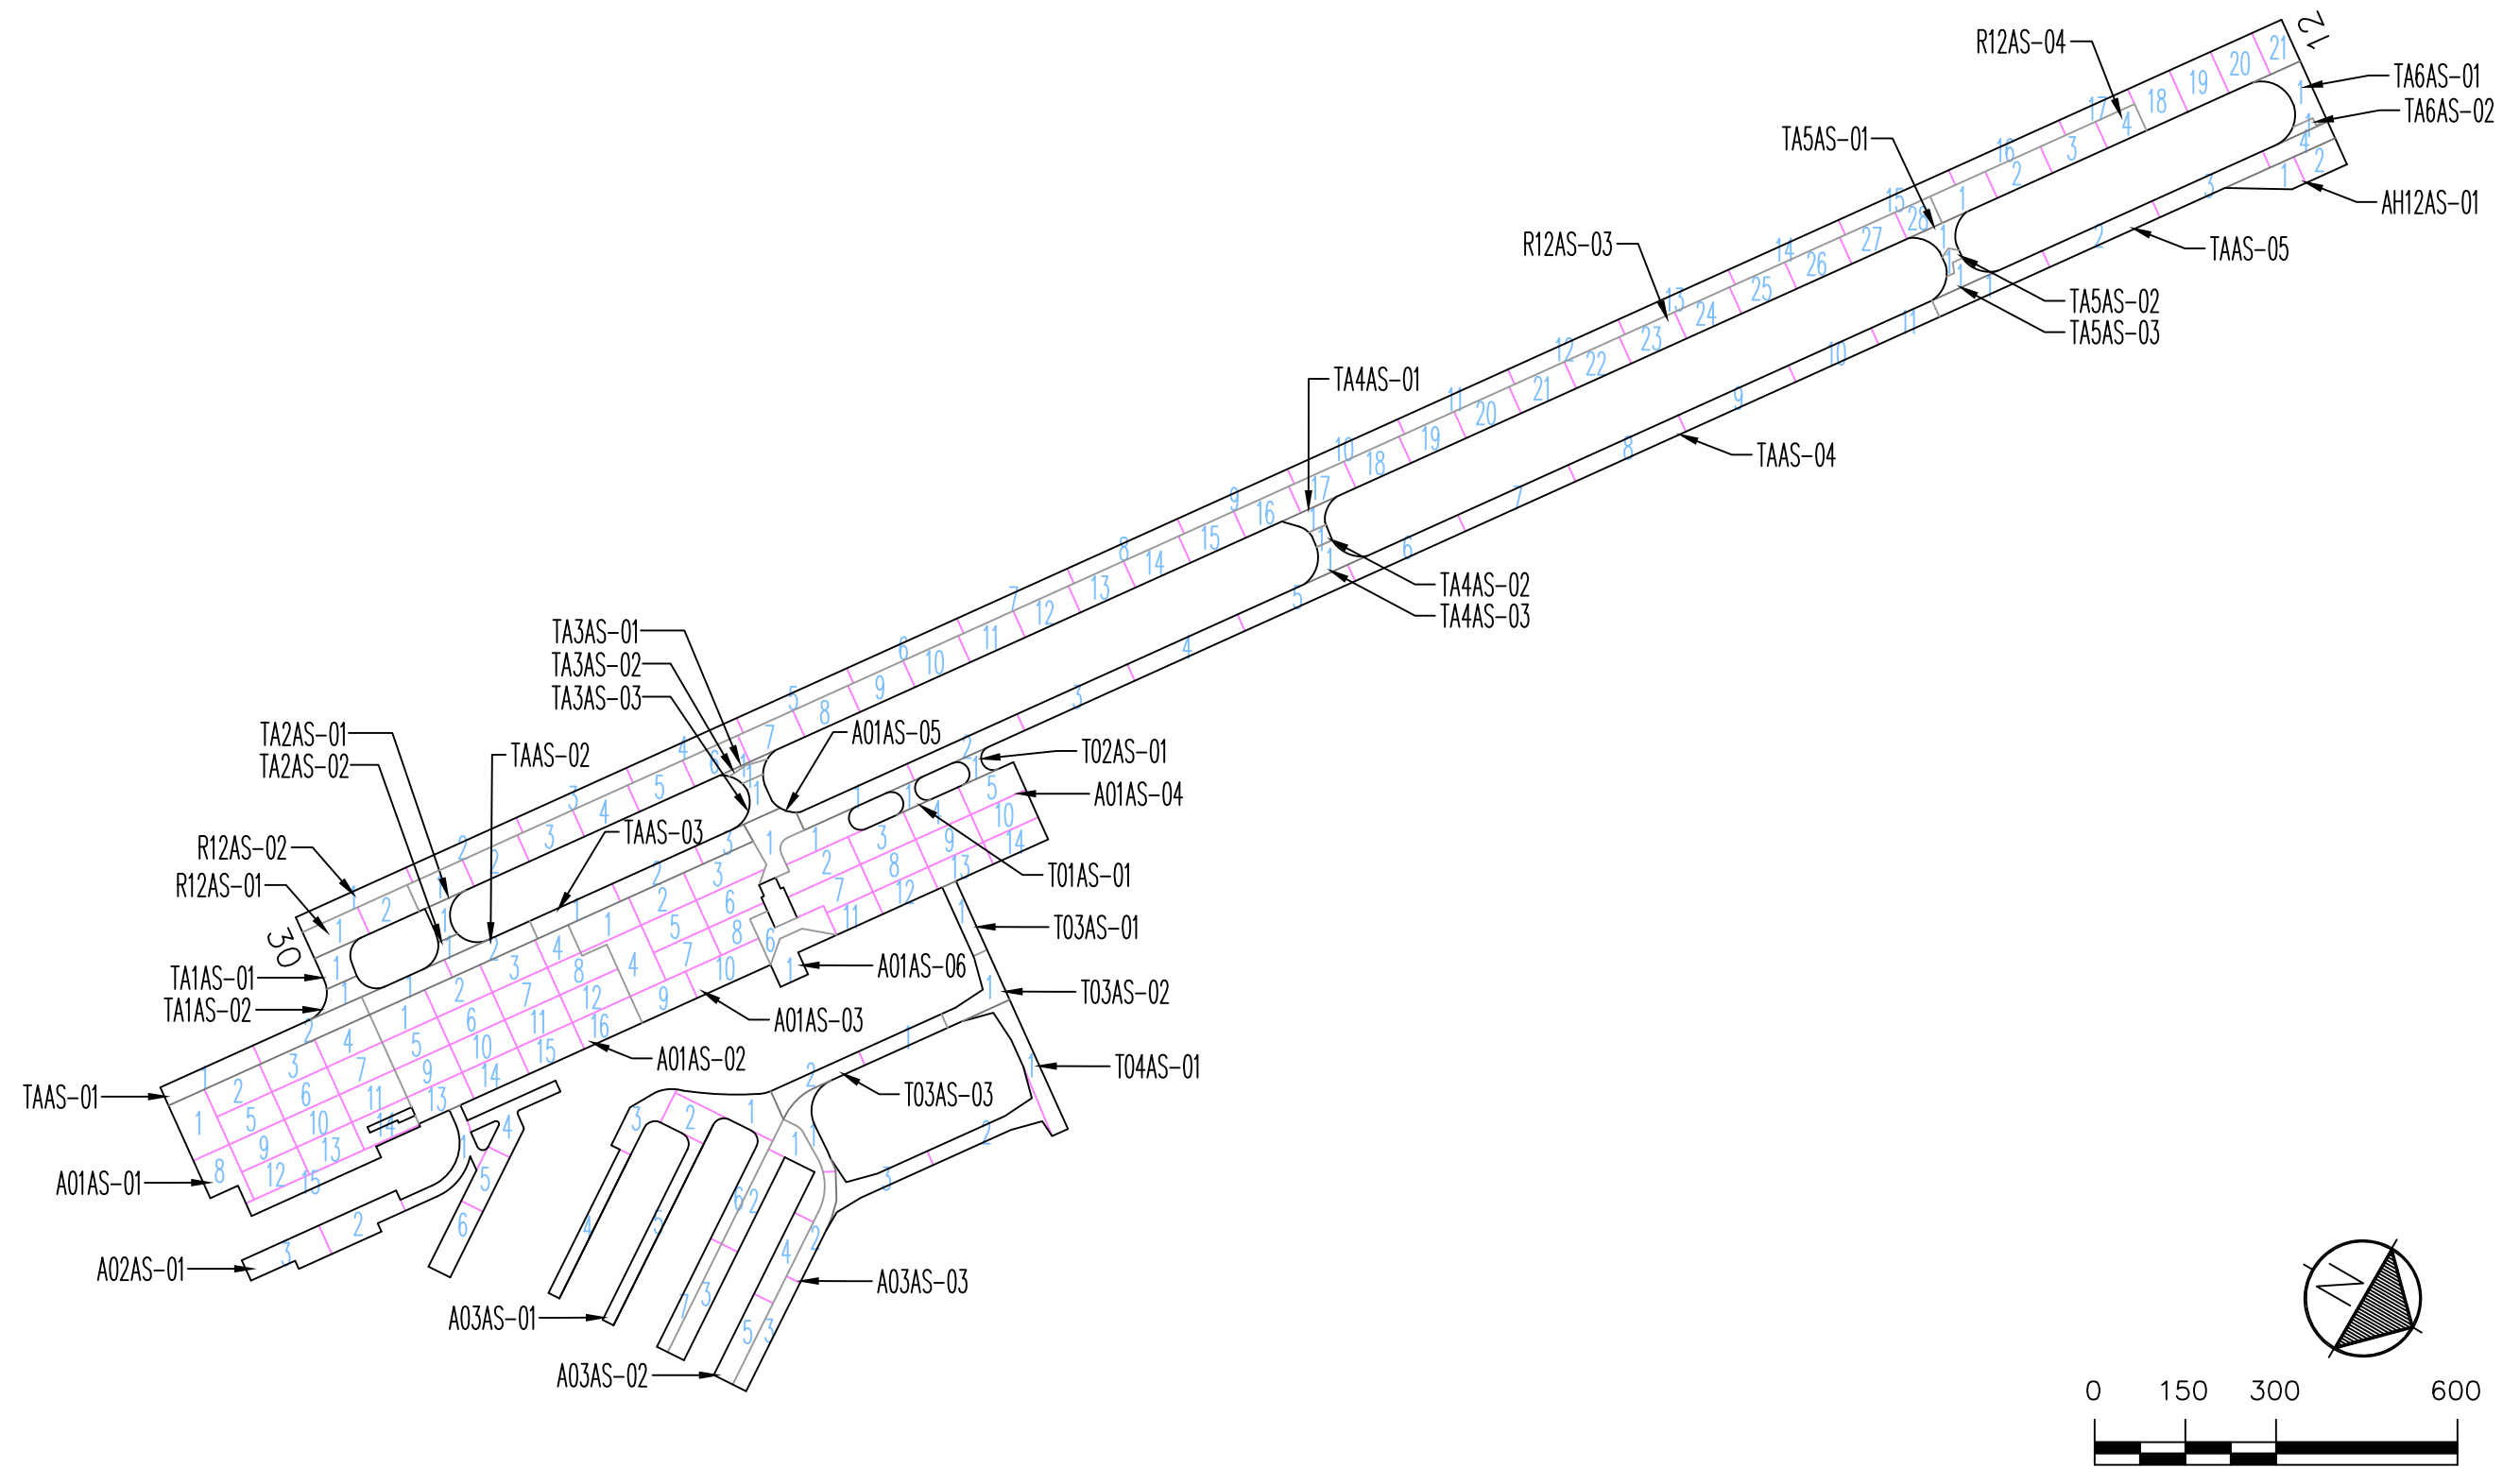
Pavement Branch, Section and Sample Unit Layout.
